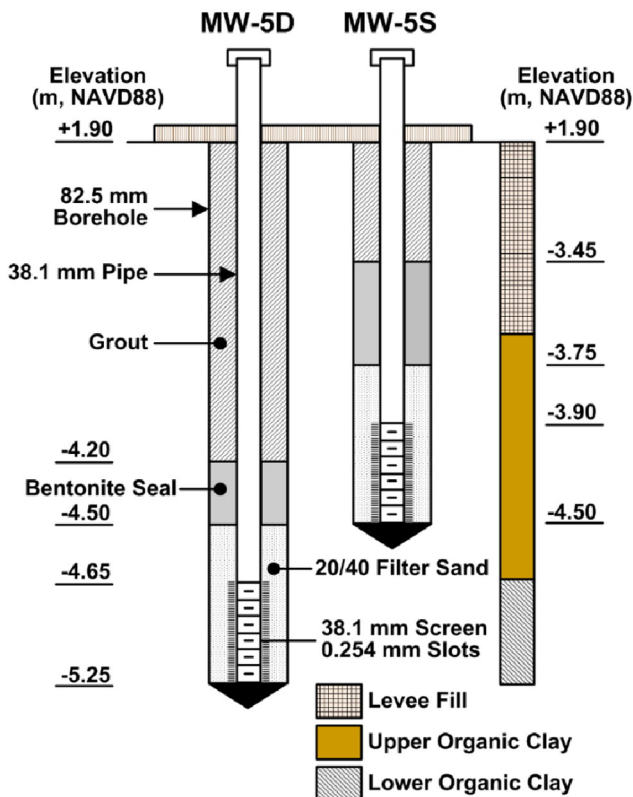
Cross-section and soil profile of MW-5S and MW-5D at Site 1 (elevation not to scale).
